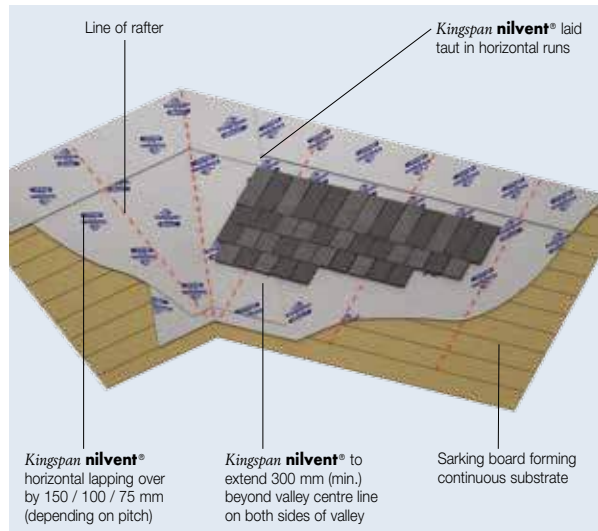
Valleys – Fully Supported Horizontal Installation with Natural Slates
